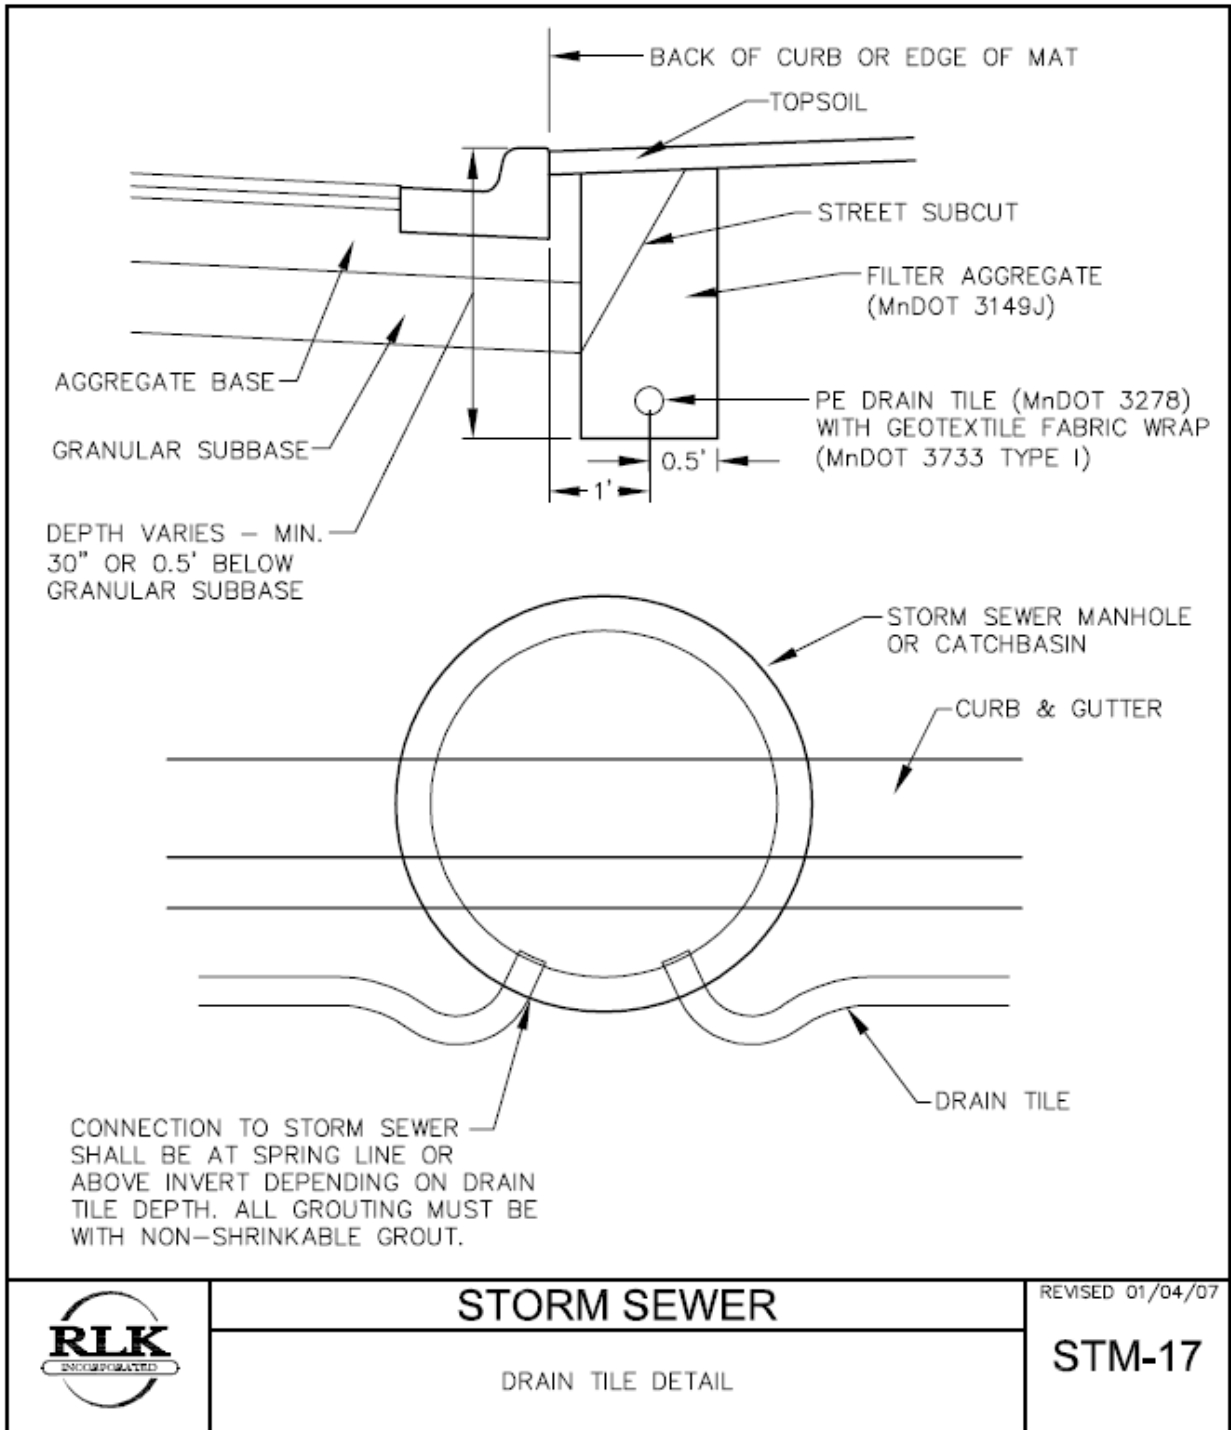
Detail connection of PE drain pipe to storm sewer (Mn/DOT, 1994b).
